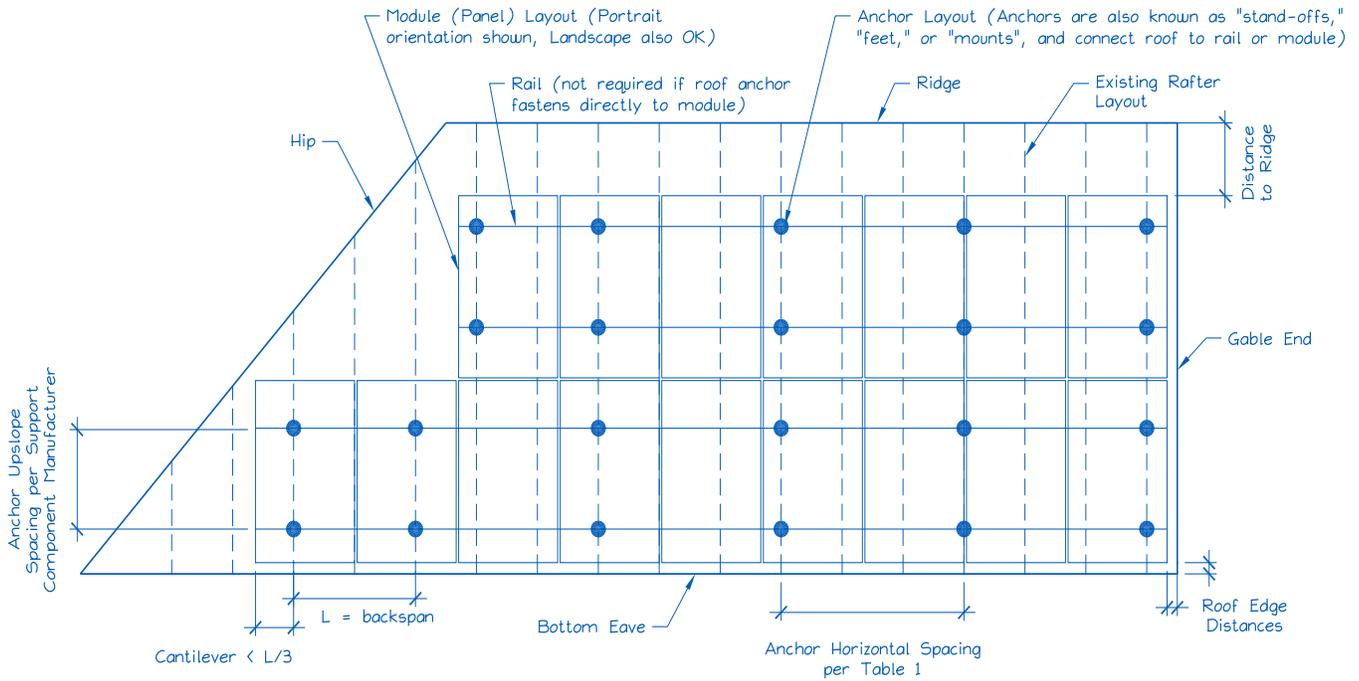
Sample Solar Panel Array and Anchor Layout Diagram (Roof Plan).
